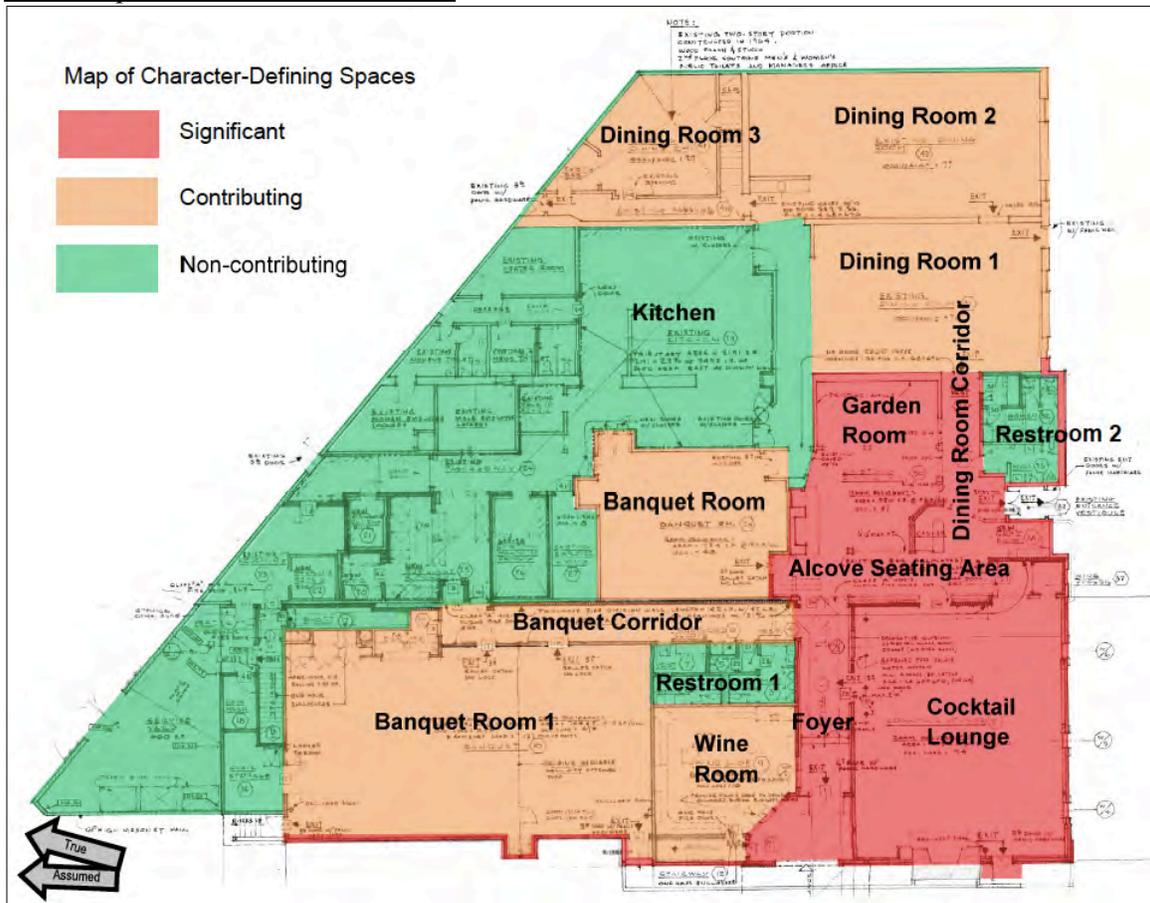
Ground floor plan with overlay identifying current nomenclature and character-defining spaces (base plan by Nielsen, Moffatt & Wolverton, 1968)
